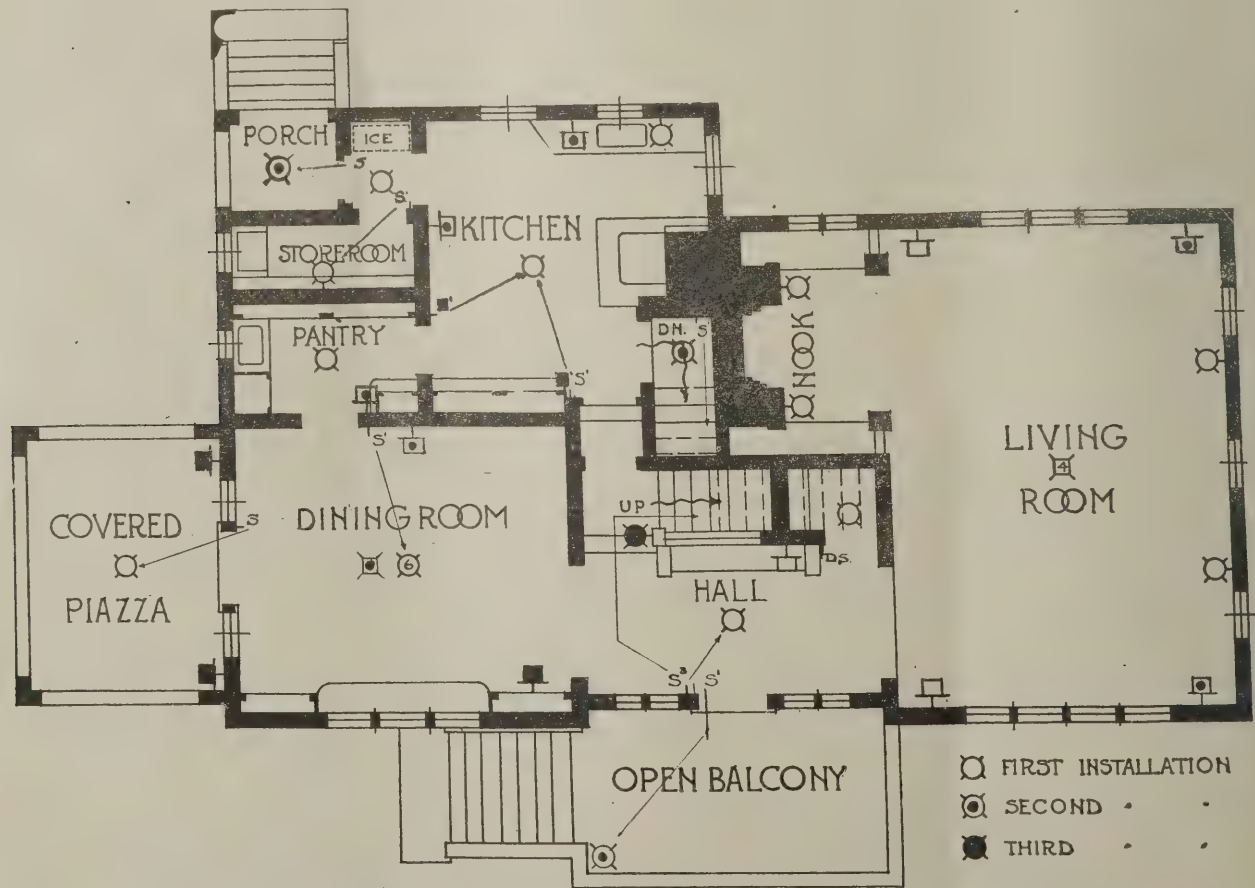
PLAN FOR FIRST FLOOR OF A NINE ROOM HOUSE SHOWING ELECTRICAL LAYOUT.
